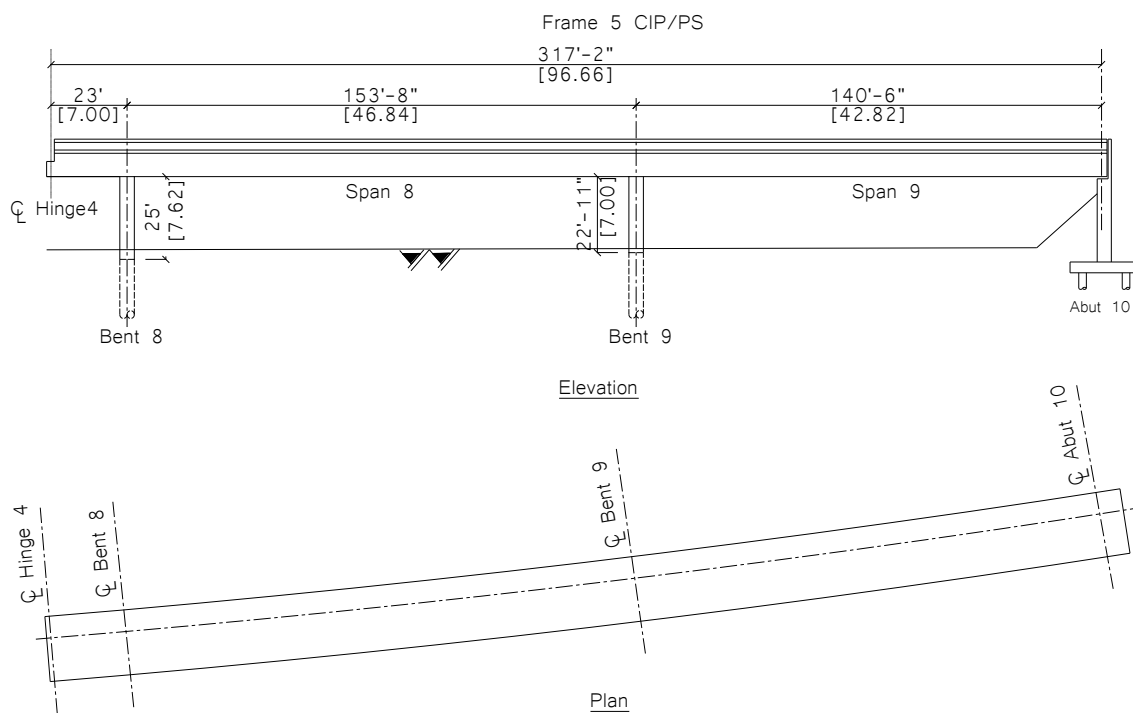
Elevation and plan views of Frame 5, Bridge 5WB
